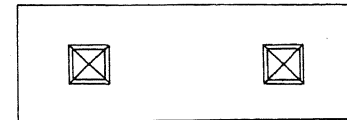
(c). PLAN of TWIN-TOWER BUILDING.
